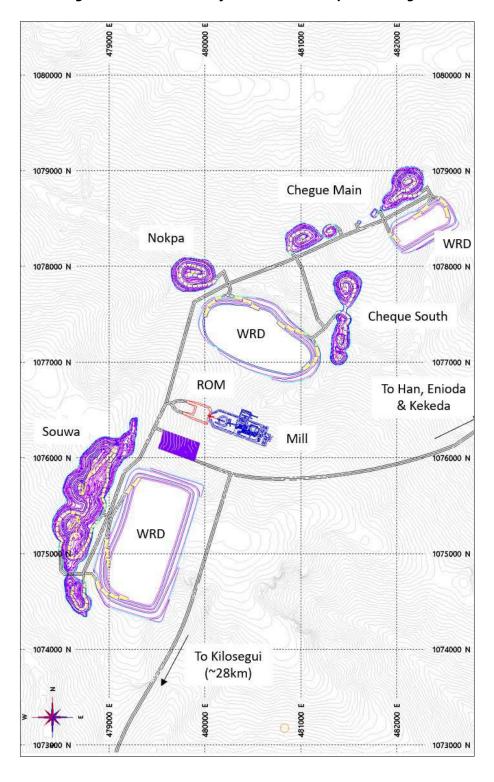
Site Layout – Souwa, Nokpa and Chegue
